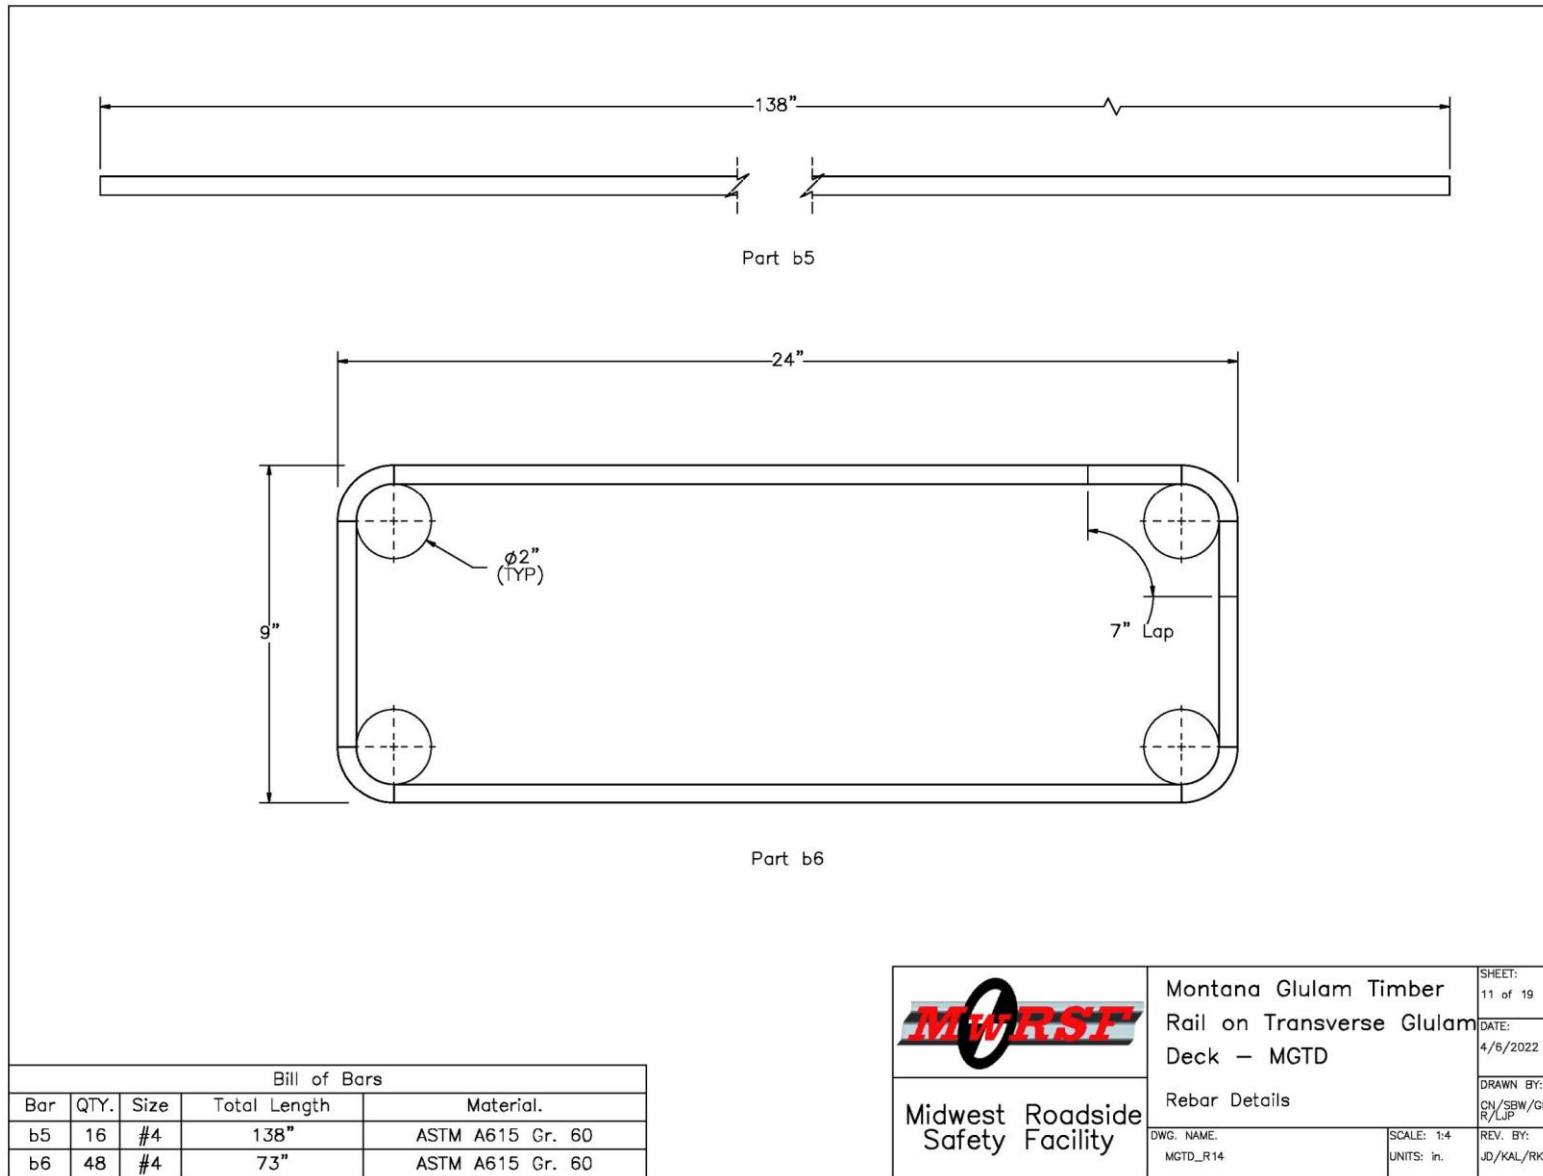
Rebar Details, Test Nos. MGTD-1S and MGTD-1D
